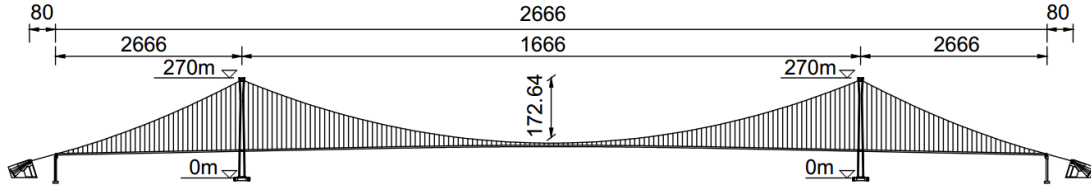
Layout of the Lingdingyang suspension bridge
